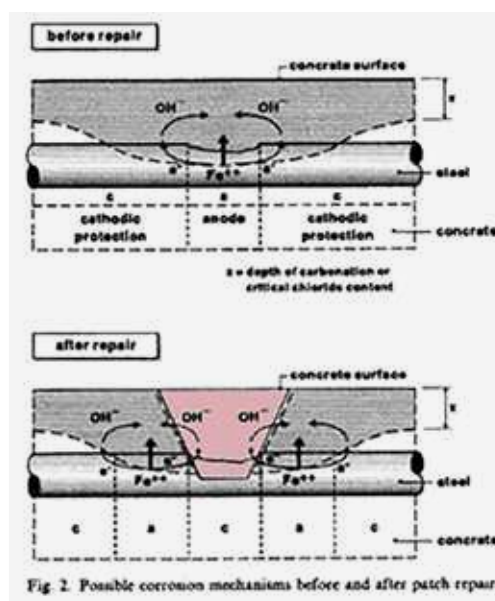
Possible corrosion mechanisms before and after patch repair.
